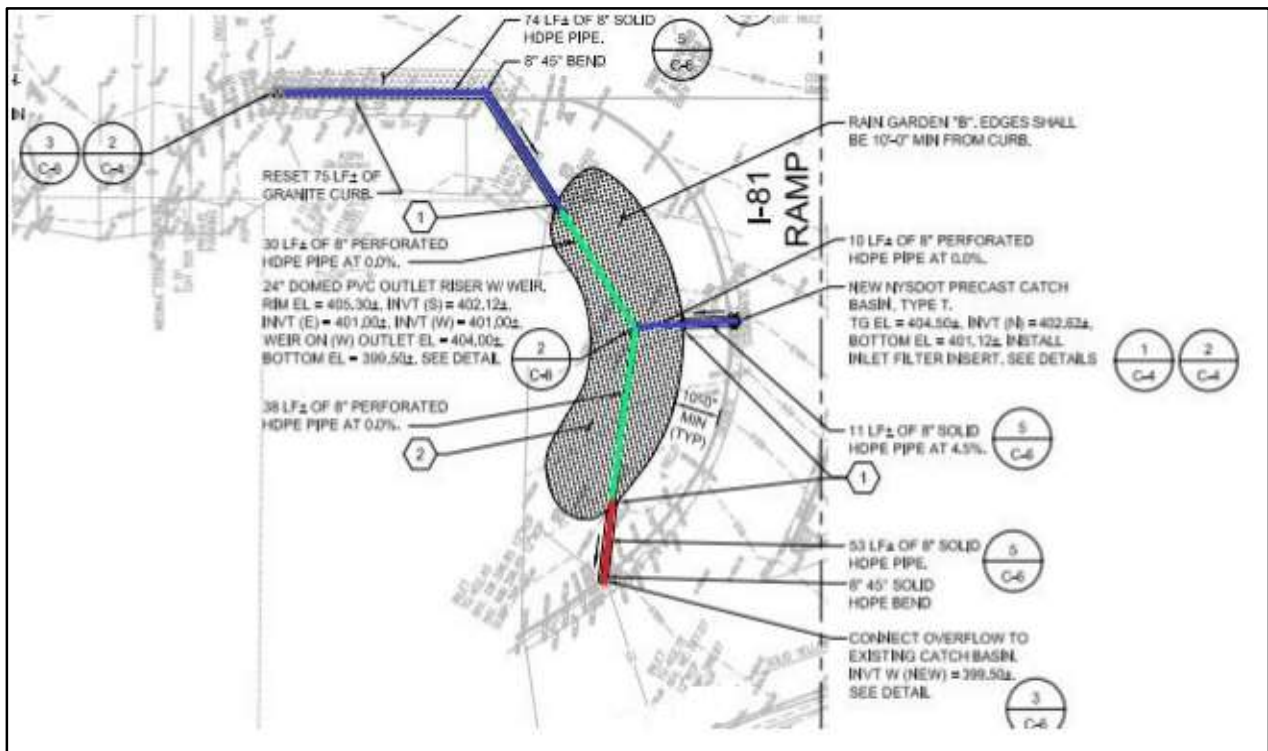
Plan View for City Parking Lot 4 Rain Garden
